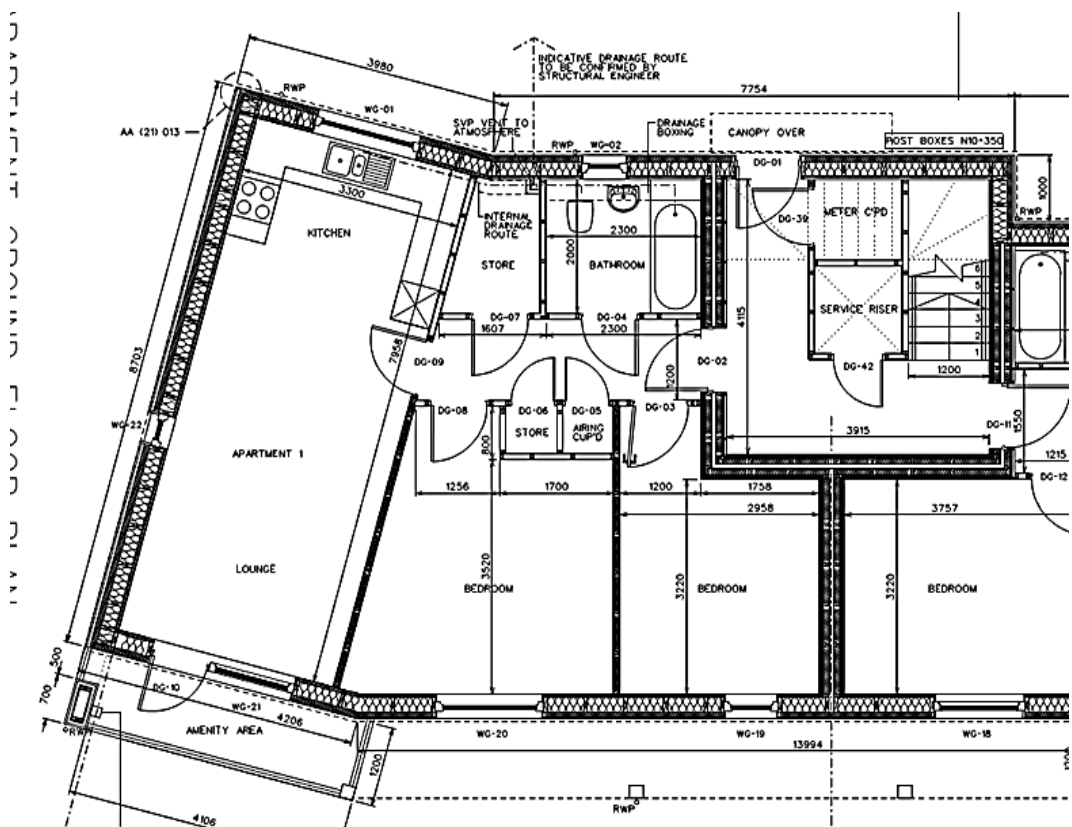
Plan Drawing of Apartment (Dwelling B)
